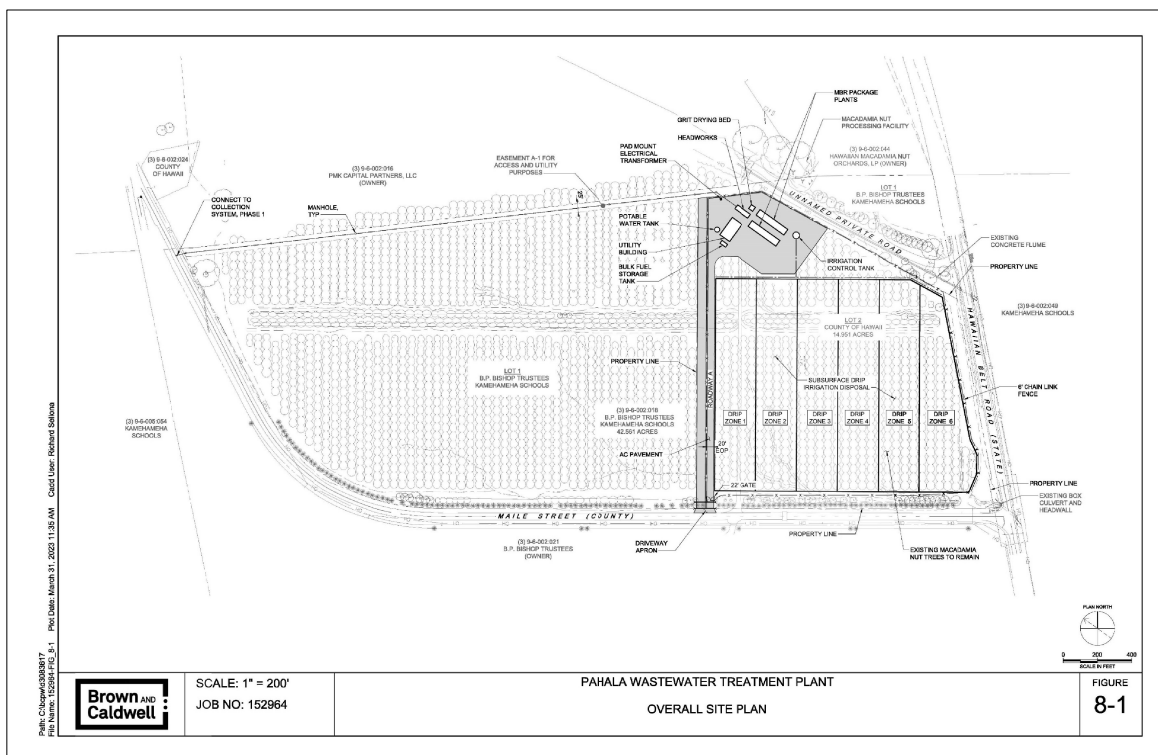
Overall site plan for proposed package plant (courtesy of client)
